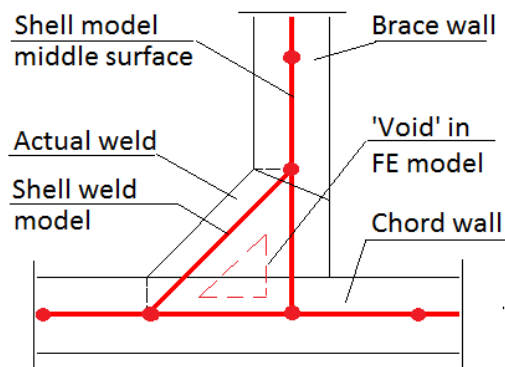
Inclusion of Weld Seam in Shell FE Models
